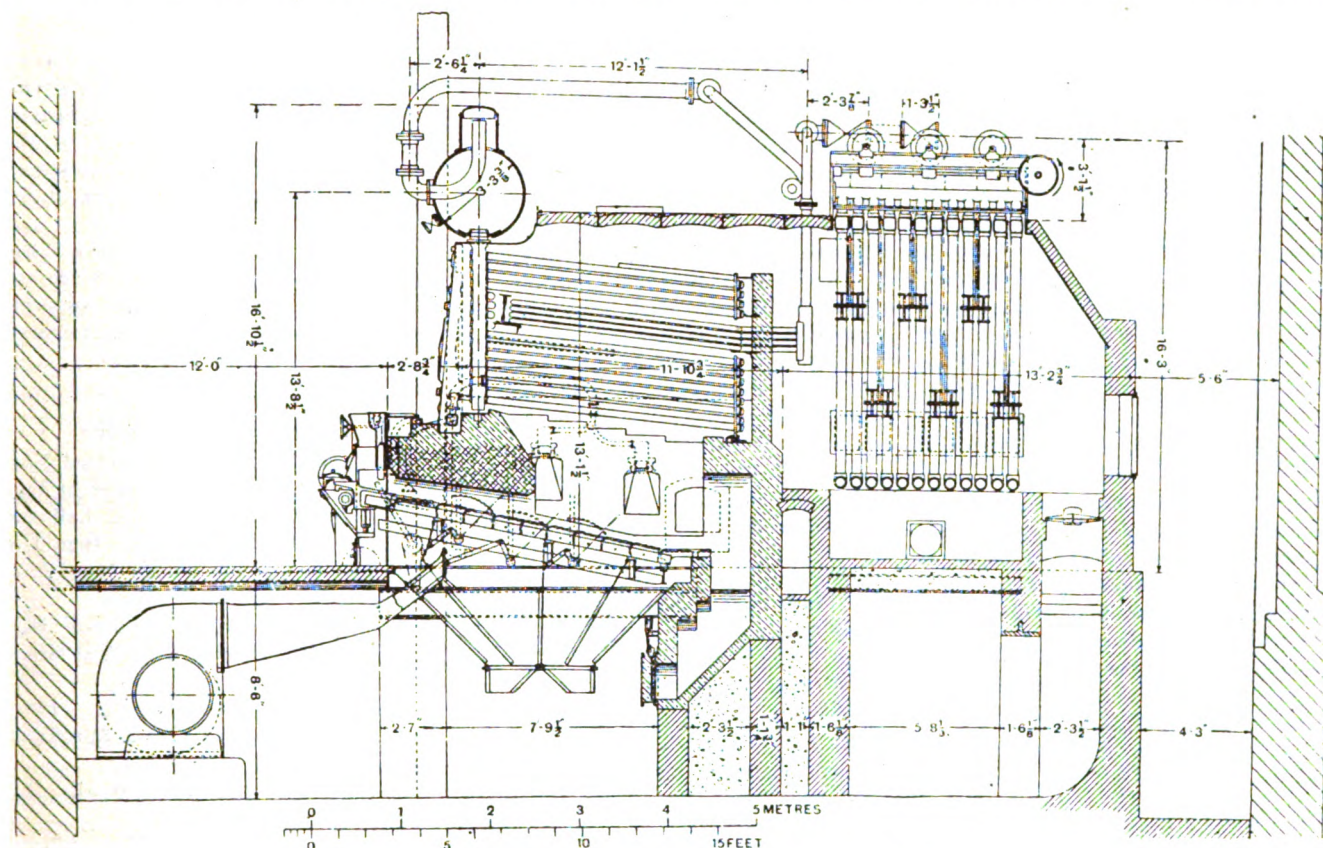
CROSS SECTIONAL ELEVATION OF SOUTHEND BOILERS
